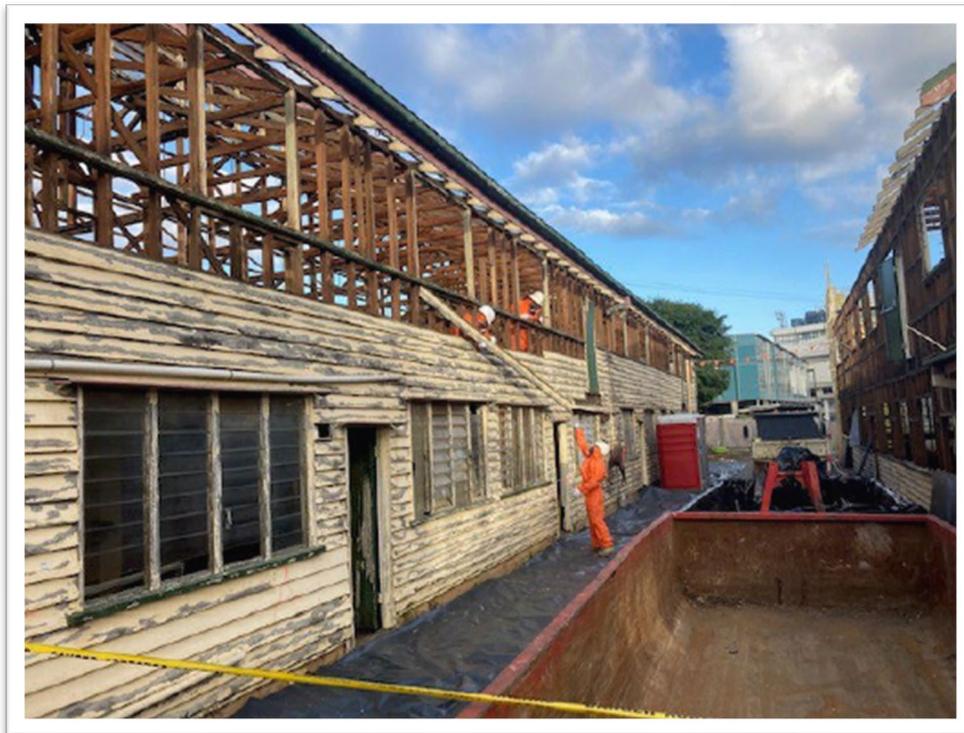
HANDLING AND ENCAPSULATION OF ACM SHEETING.
